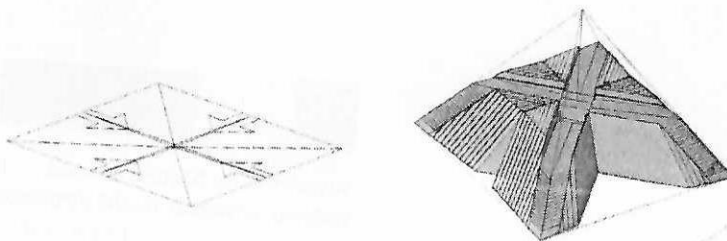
, Khufu pyramid structure composed of two crossing diagonal walls encountering eight leaning to them walls; its base was divided into four inclined planes.
